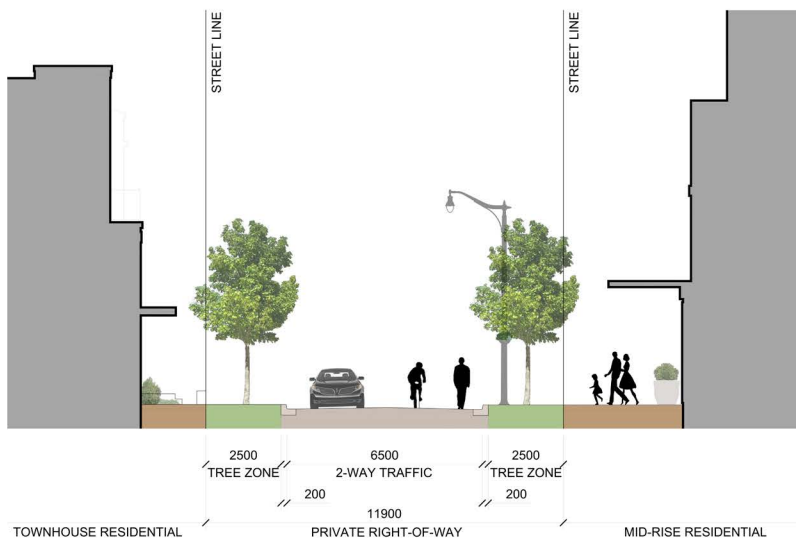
11.9m Shared Street - Private Condominium Driveway - No On-Street Parking
